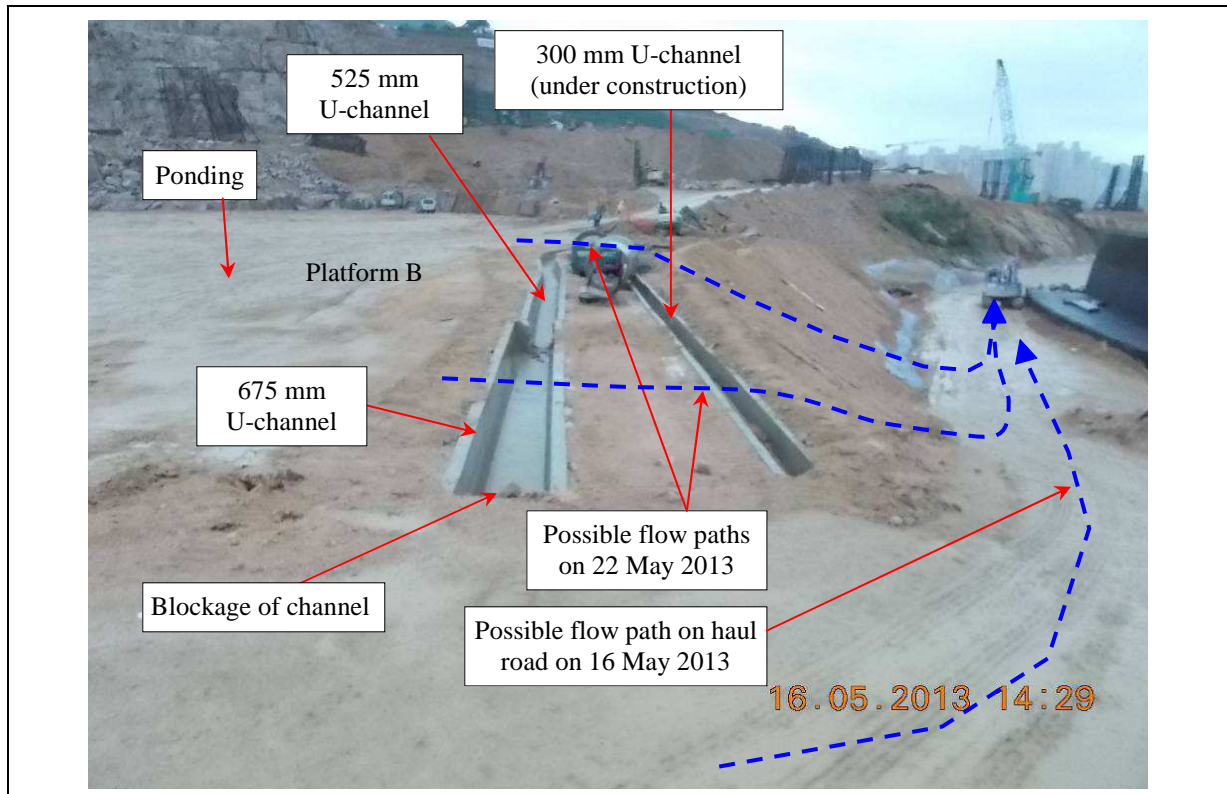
Temporary Haul Road over the 675 mm U-channel between Sand Traps ST15 and ST16 (Photograph taken on 16 May 2013)
